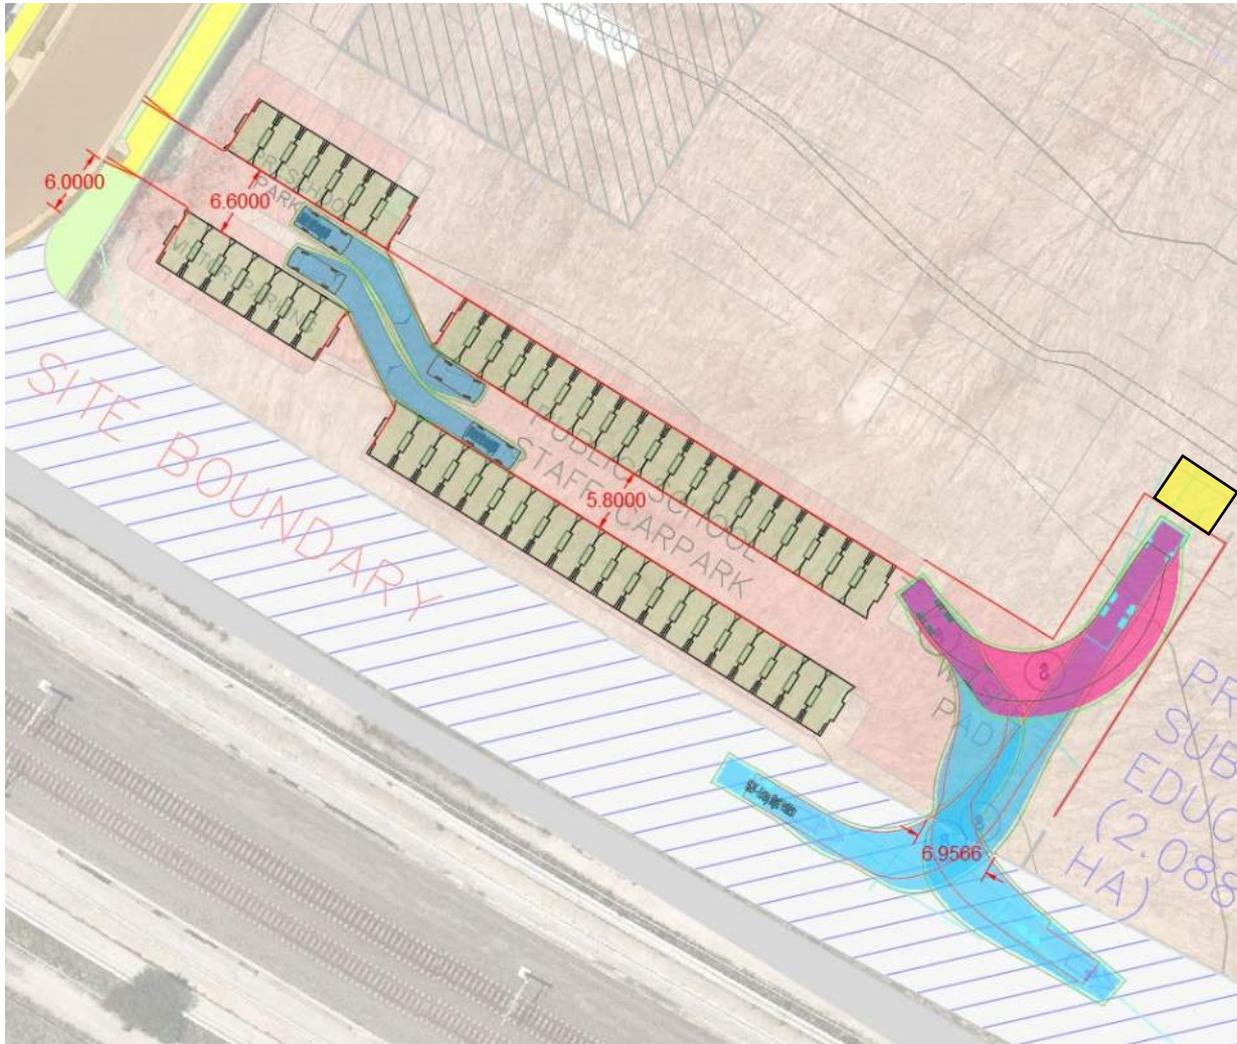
Waste collection – in and outbound off future south road – front loader (not recommended)
